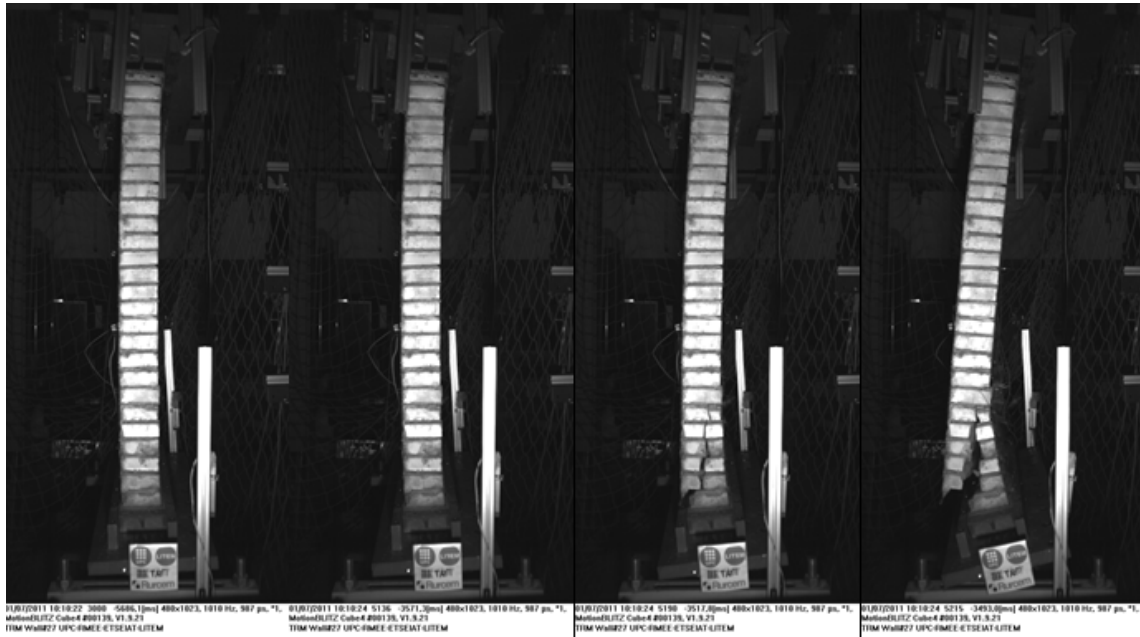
230 Failure of the wall W#27. Masonry failure at wall's bottom.
